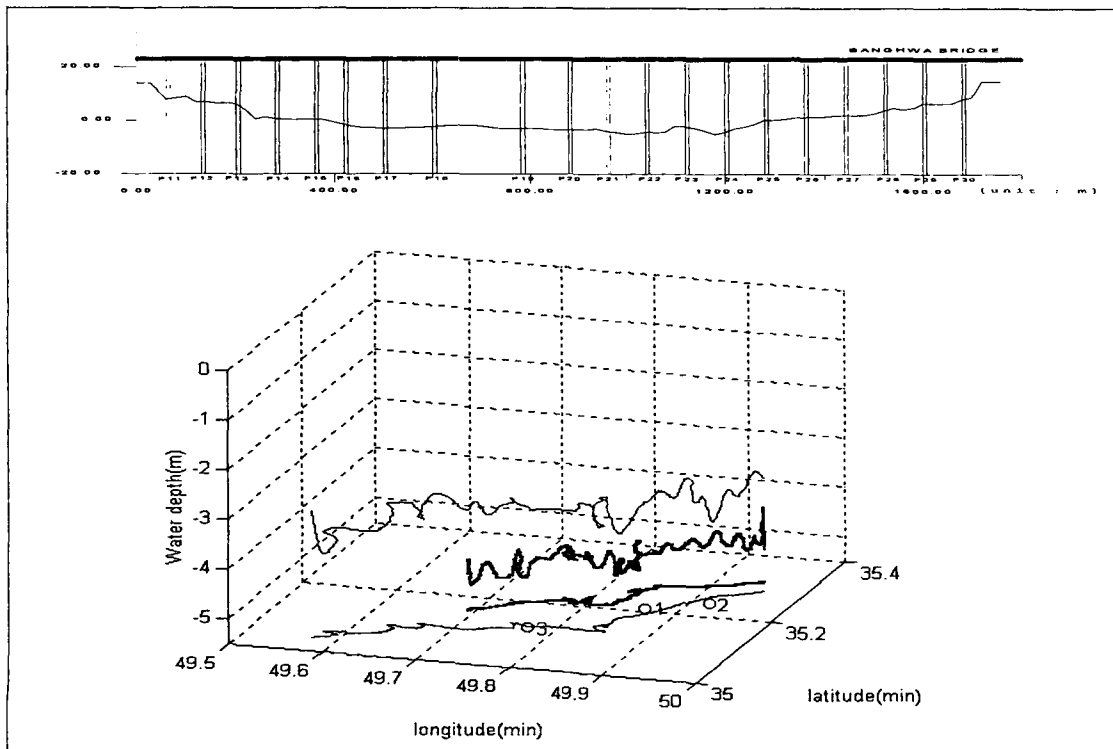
Location of piers and water depth measurement using the PPDL12 and GPS at 37N,126E (Bangwha bridge construction site).
